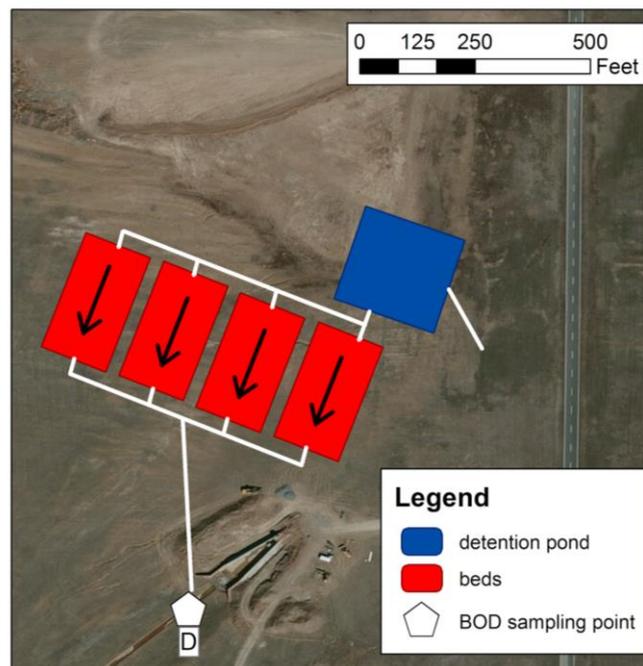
Plan view of proposed layout for subterranean aerated gravel beds and corresponding detention pond near sampling location D.
